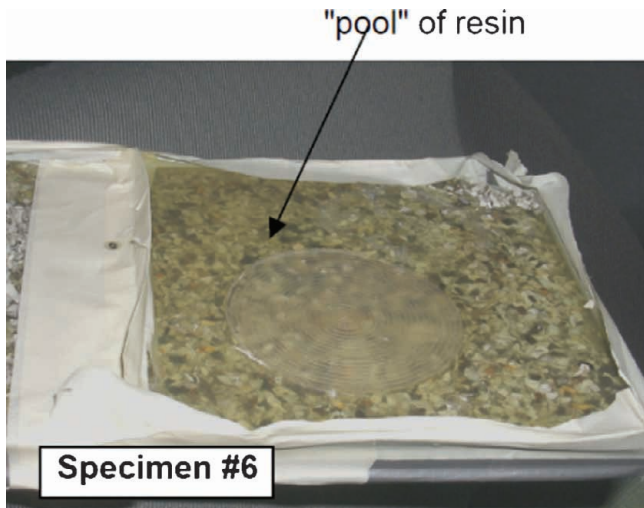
Failure of Steel Disk to Wearing Surface in Test Specimen #6
